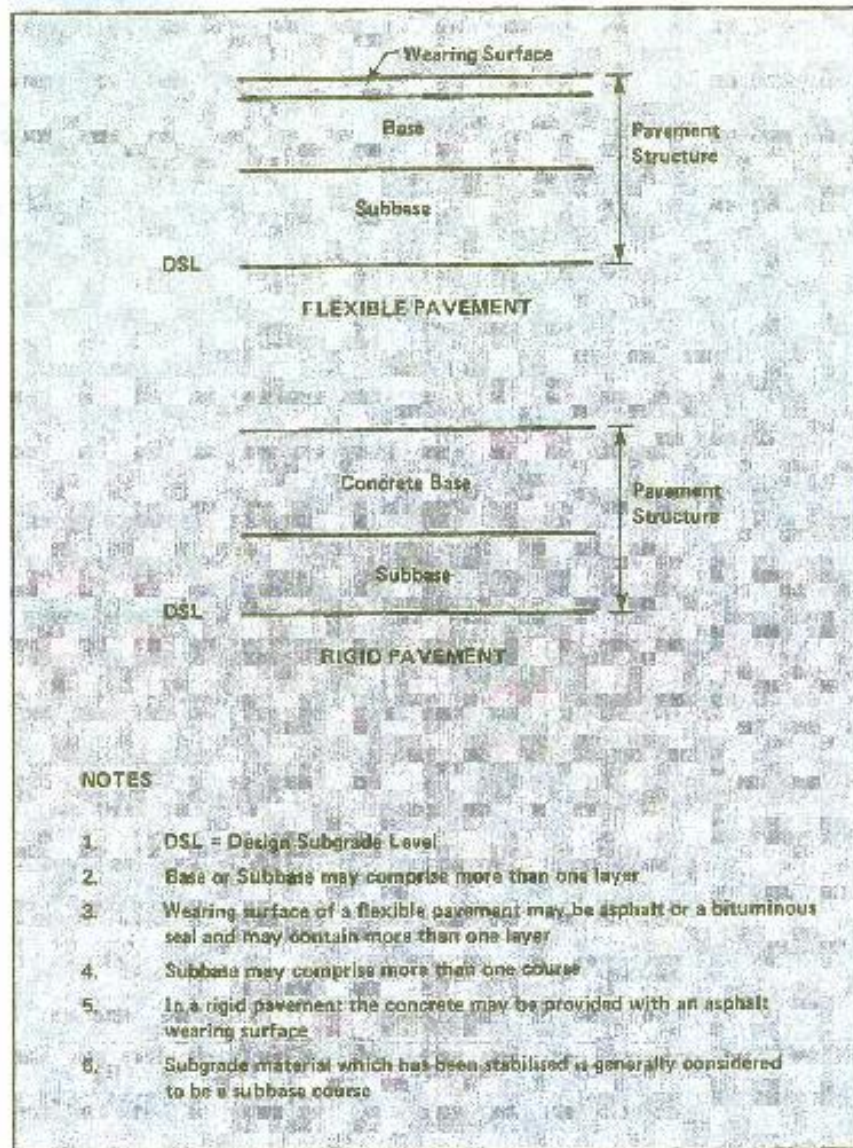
COMPONENTS OF FLEXIBLE AND RIGID ROAD PAVEMENT STRUCTURES
